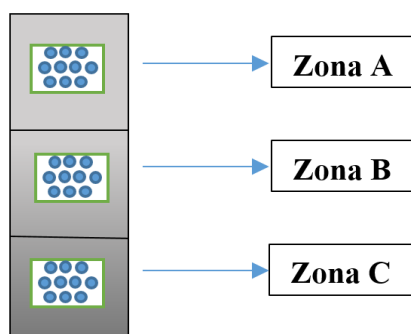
The zones for shooting at column surface for Rebound Hammer Test
